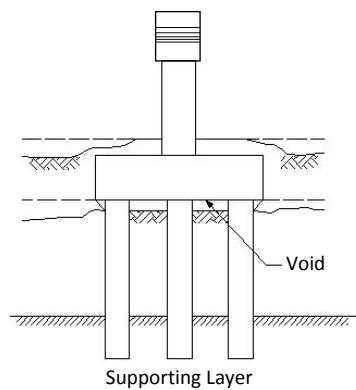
Generation of Voids underneath Footings
